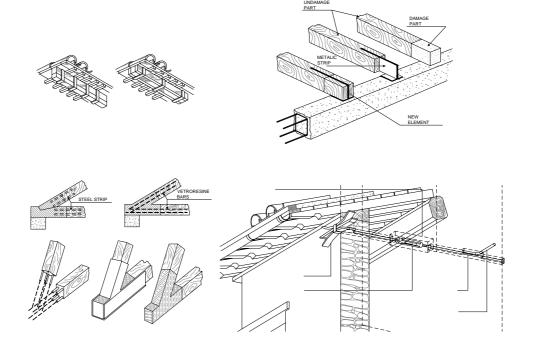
Some examples of repairing and strengthening of existing wooden roofs
